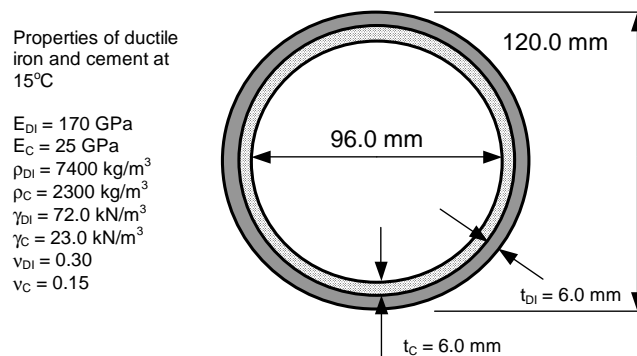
Cross section and details of the Kookaburra Court Pipeline
